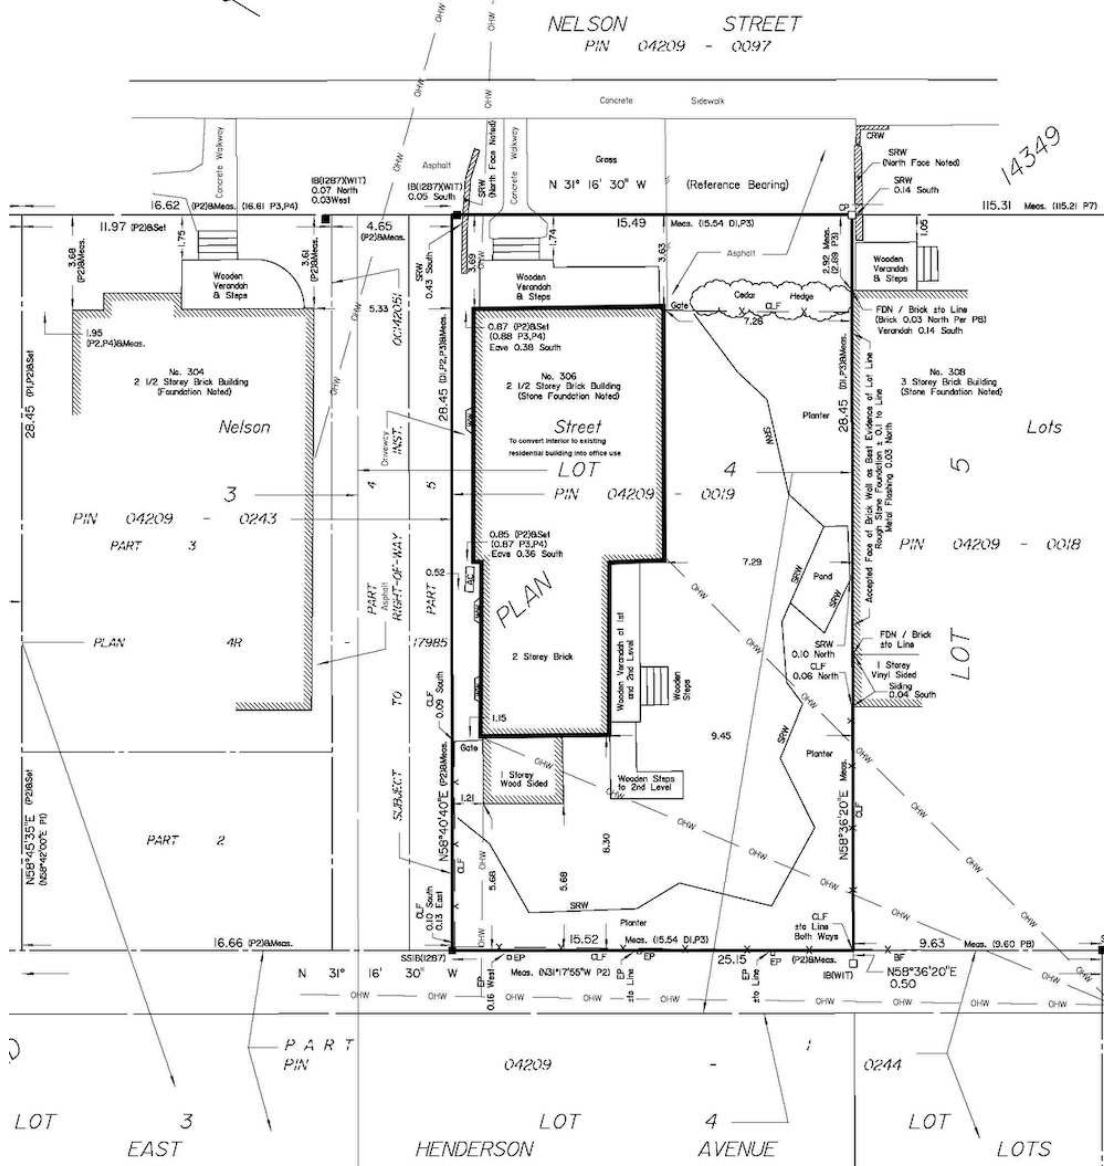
Extract of Site Plan (Prepared by: AOV Surveying)
